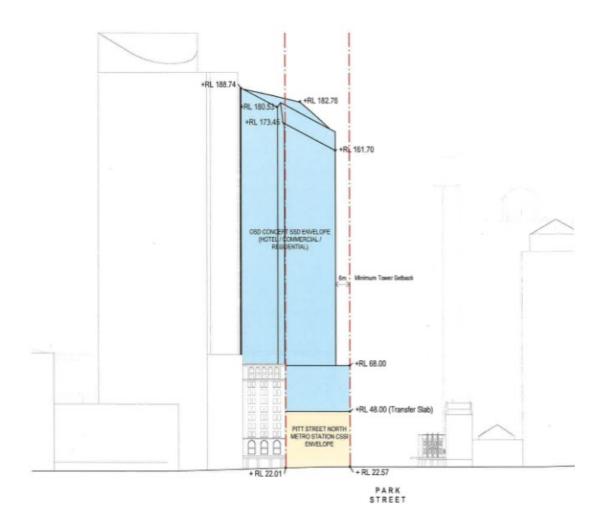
Pitt Street North Concept SSD DA – Envelope – West Elevation
